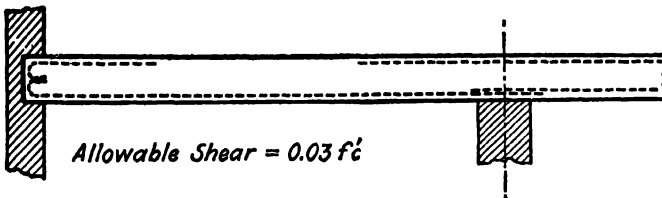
Typical reinforced concrete beam; principal longitudinal bars anchored.
